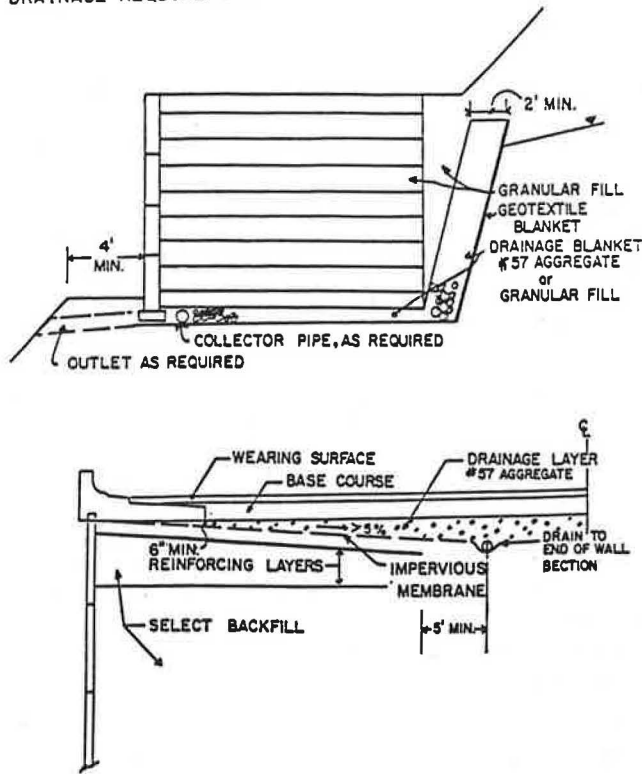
Drainage requirements: *top*, drainage blanket detail; *bottom*, impervious barrier detail.
